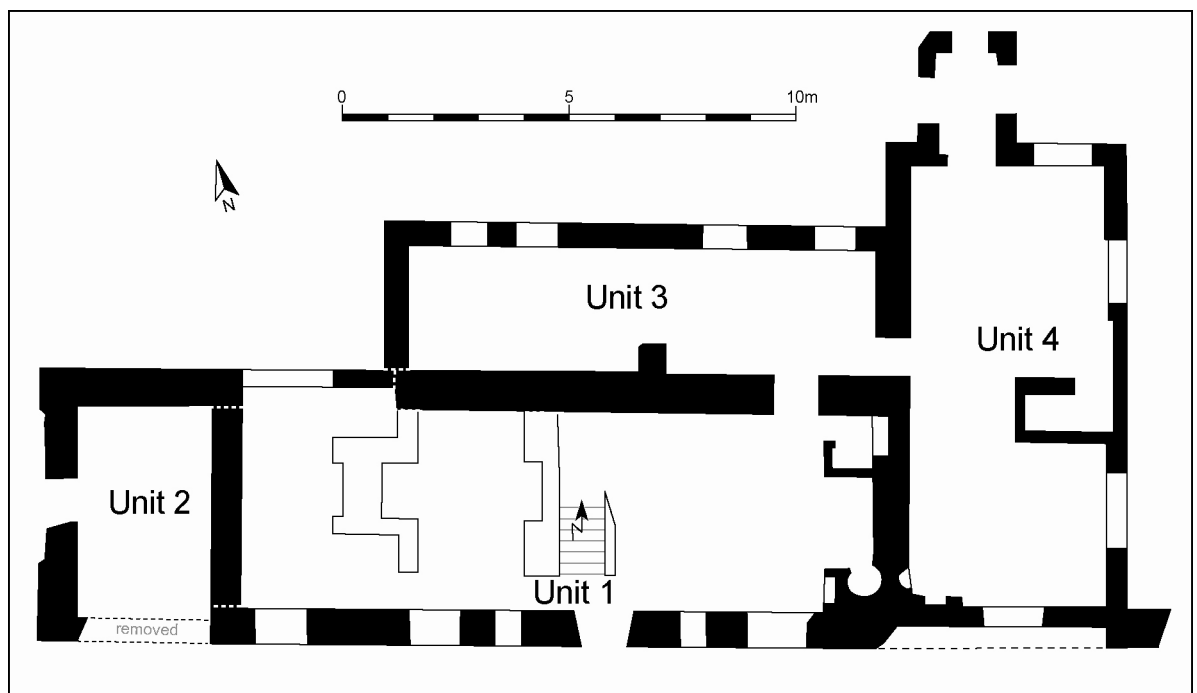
Ground floor plan of the surviving structures at Knowstone Mill.
